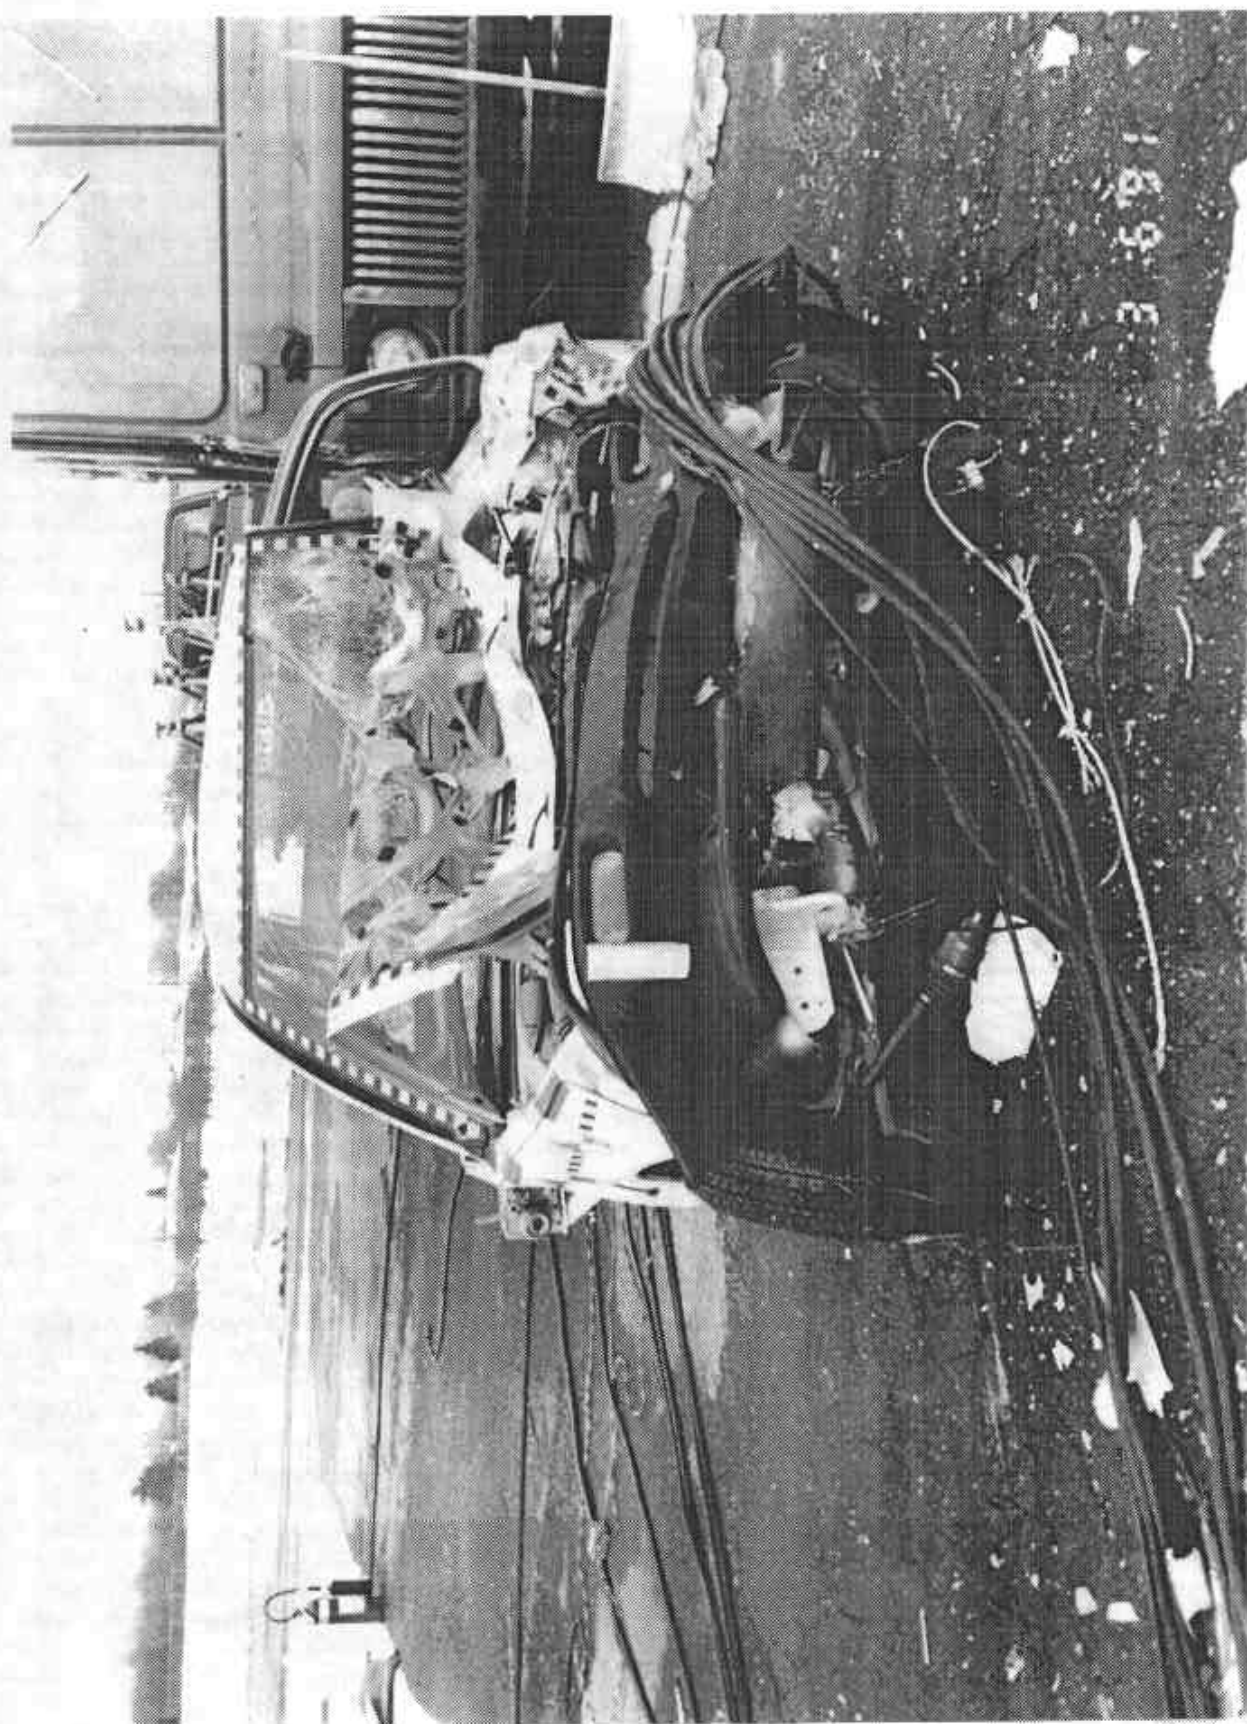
VEHICLE 1 POST-TEST FRONT VIEW
